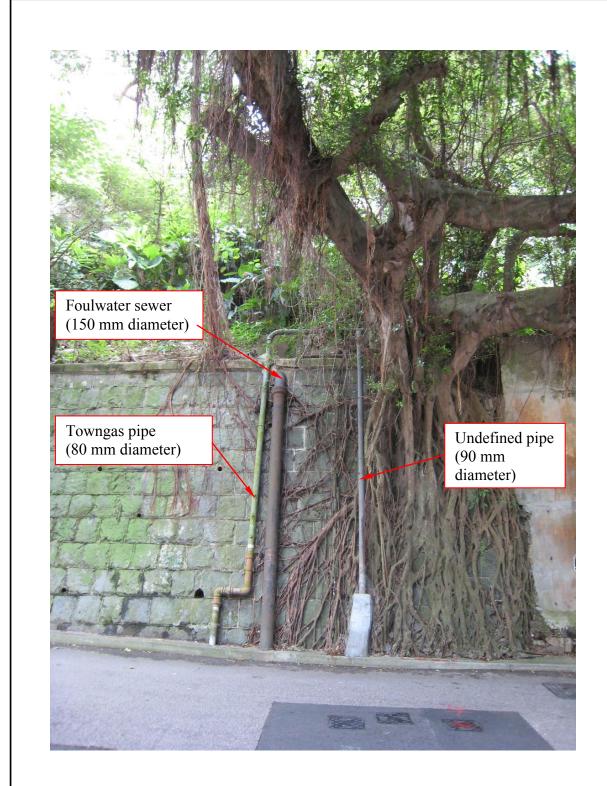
Exposed Pipelines and Large Tree at Western End of Retaining Wall No. 11SW-A/R677 (Photograph taken on 5 September 2007)
